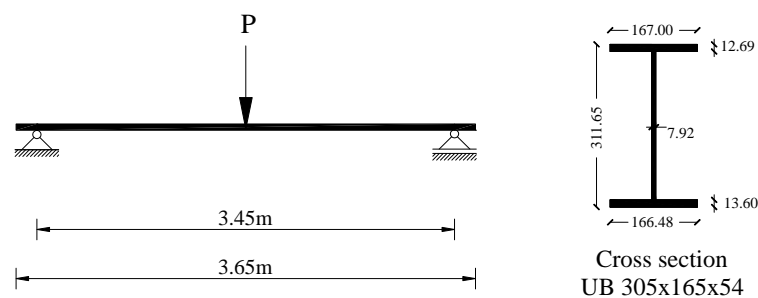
The structural system and the cross section (dimensions of the cross section in mm).
